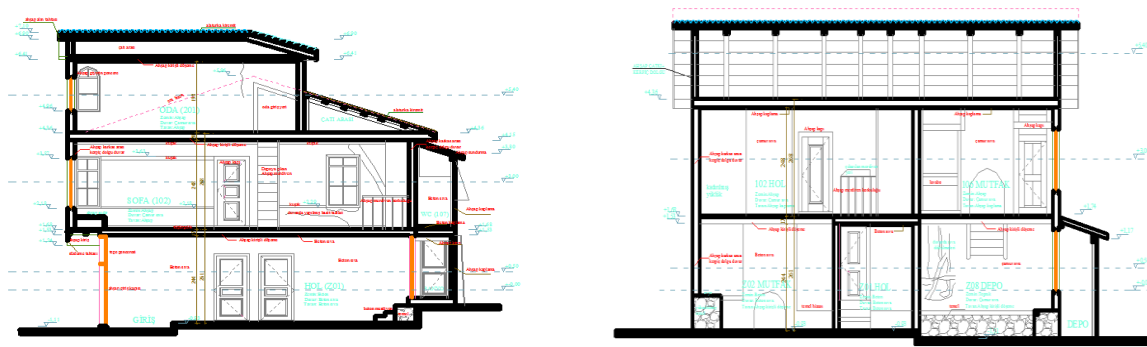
Halim Düzgün House's rollove a-a section and b-b section
